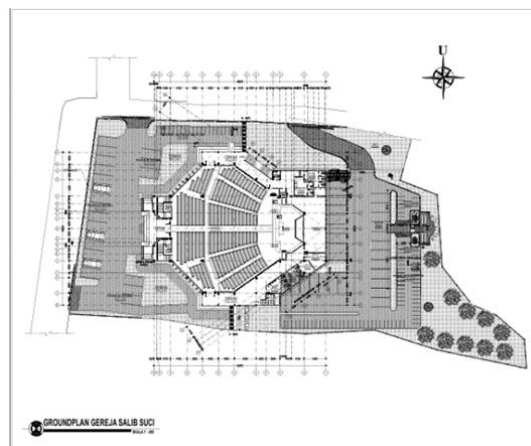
Plan for the Construction of the Holy Cross Catholic Church Tj. Anom
